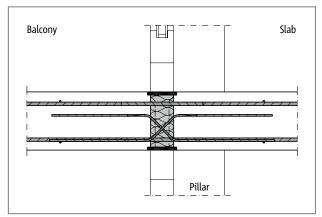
Schöck Isokorb® T type D: Installation section; one-way spanning
